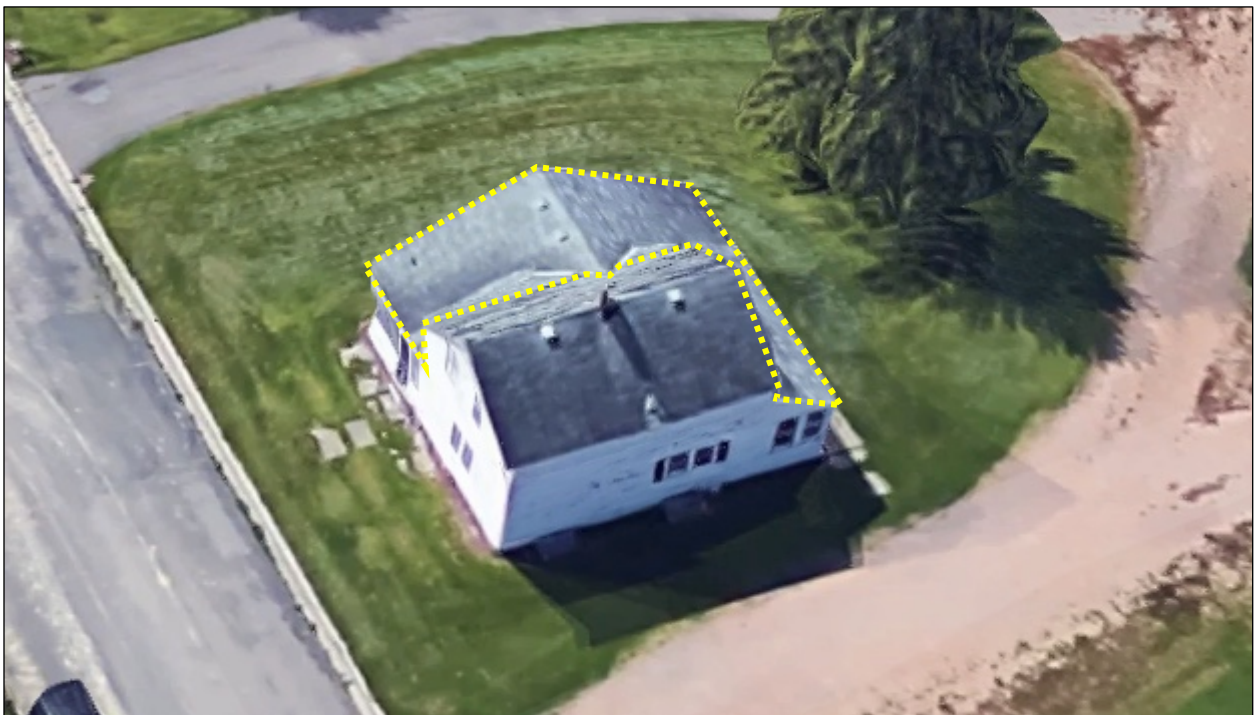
Birdseye view, showing east and north elevations. Addition is outlined.
